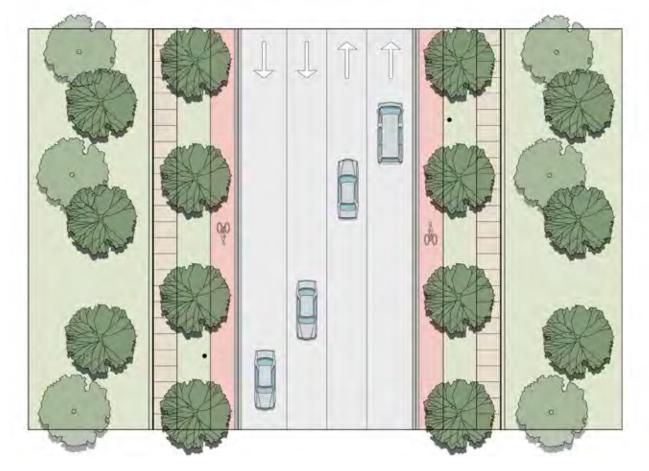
26.0m Major Collector Road ROW - East-West Connector Road
